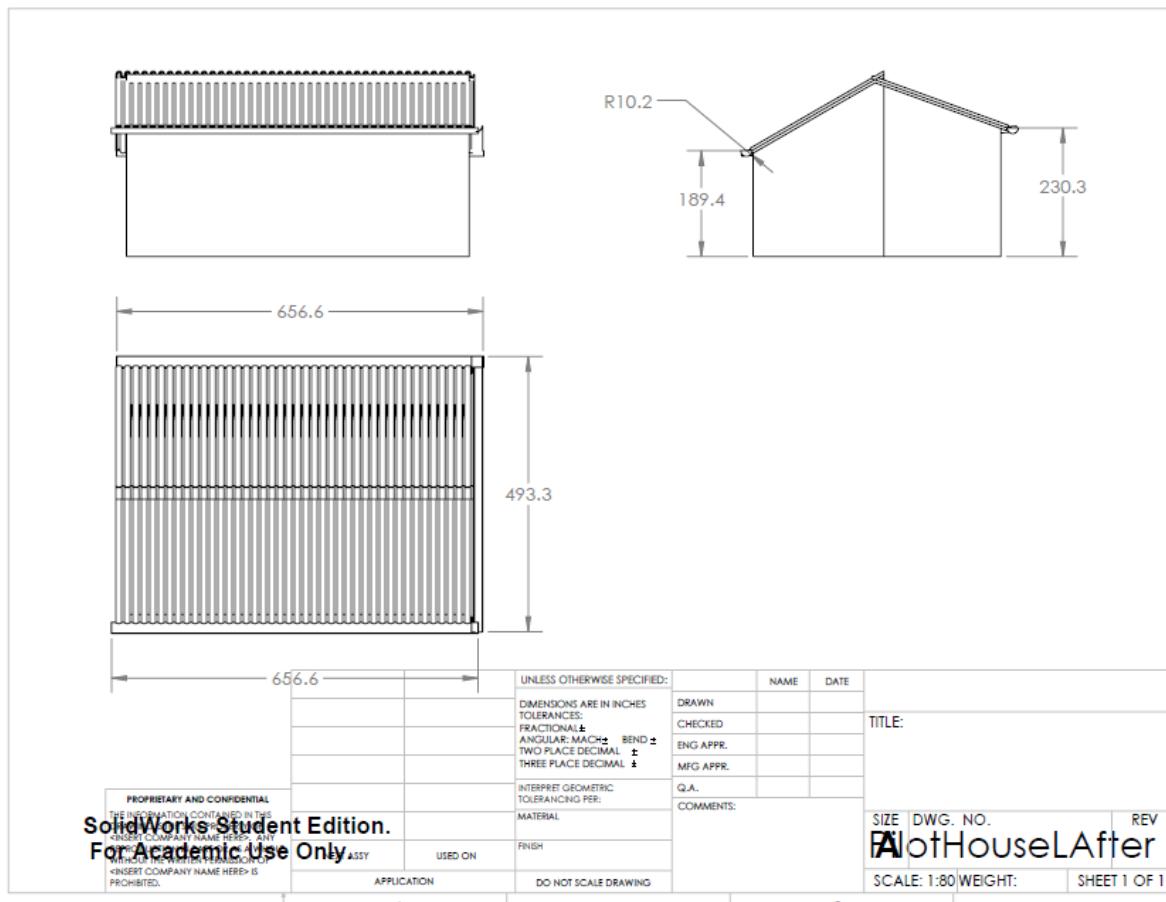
House L Proposed Design Measurements - Roof 3 and 4
